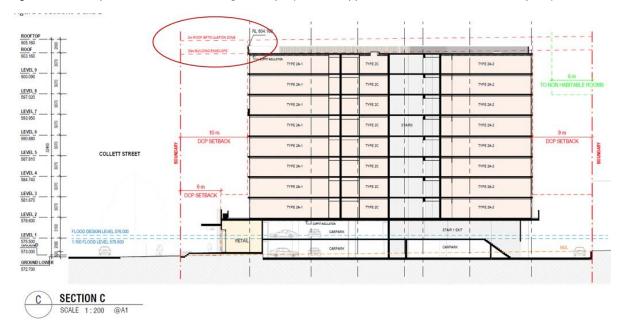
Section C east/west through the building – northern end (Source: Applicant's Clause 4.6 Variation)
